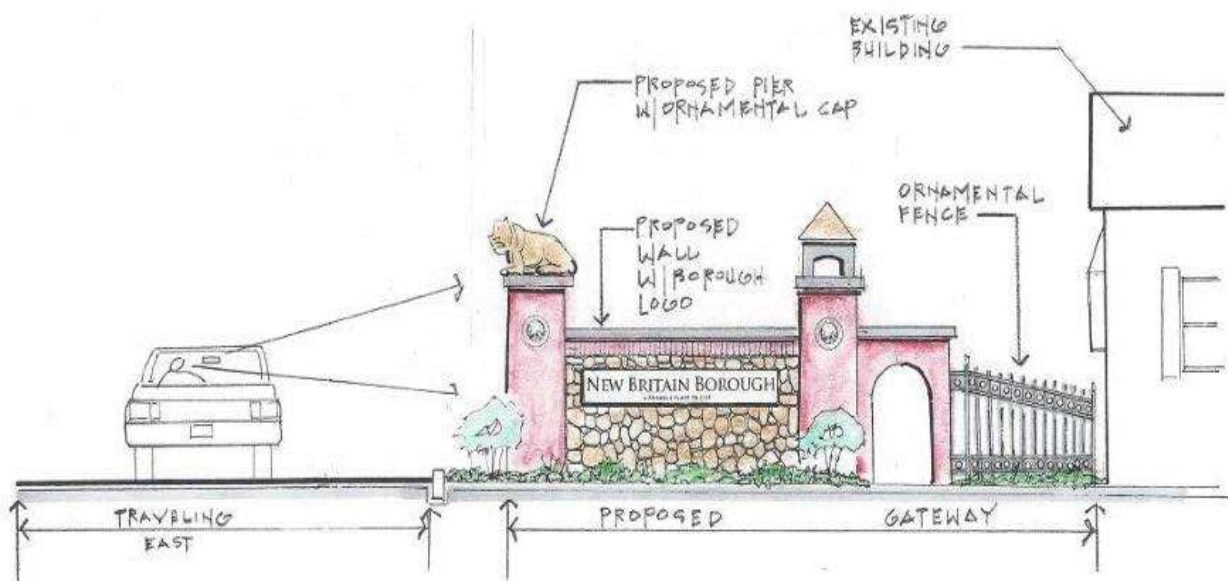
Western Gateway Concept Cross-Section Traveling East on West Butler Avenue
